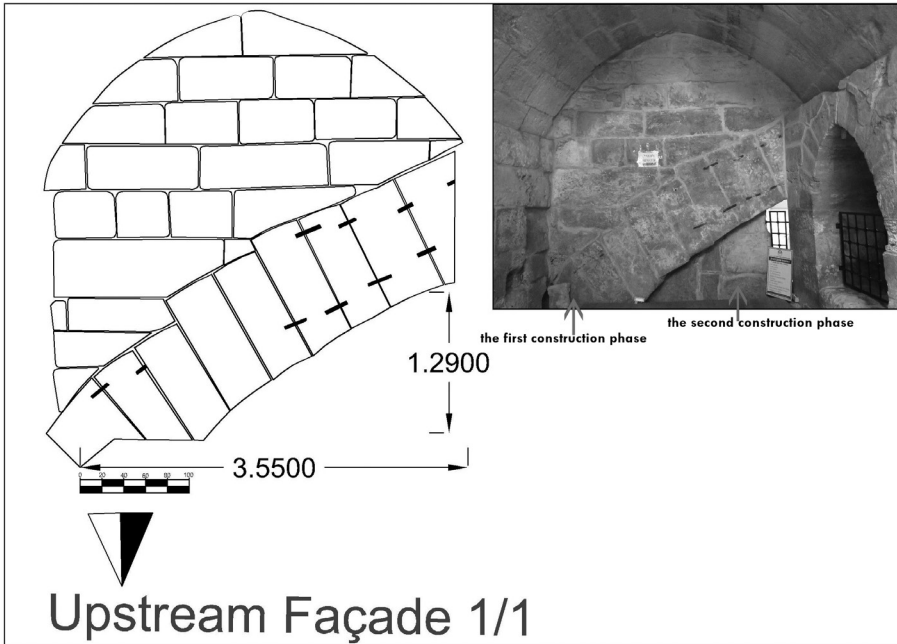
Drawing of the Upstream Façade (Drawing: İlkay Göçmen).
